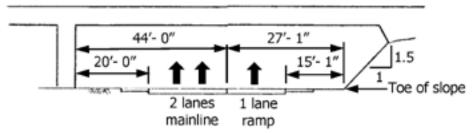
Bridge elevation view of horizontal clearances for a highway feature below the bridge carrying mainline and ramp.
